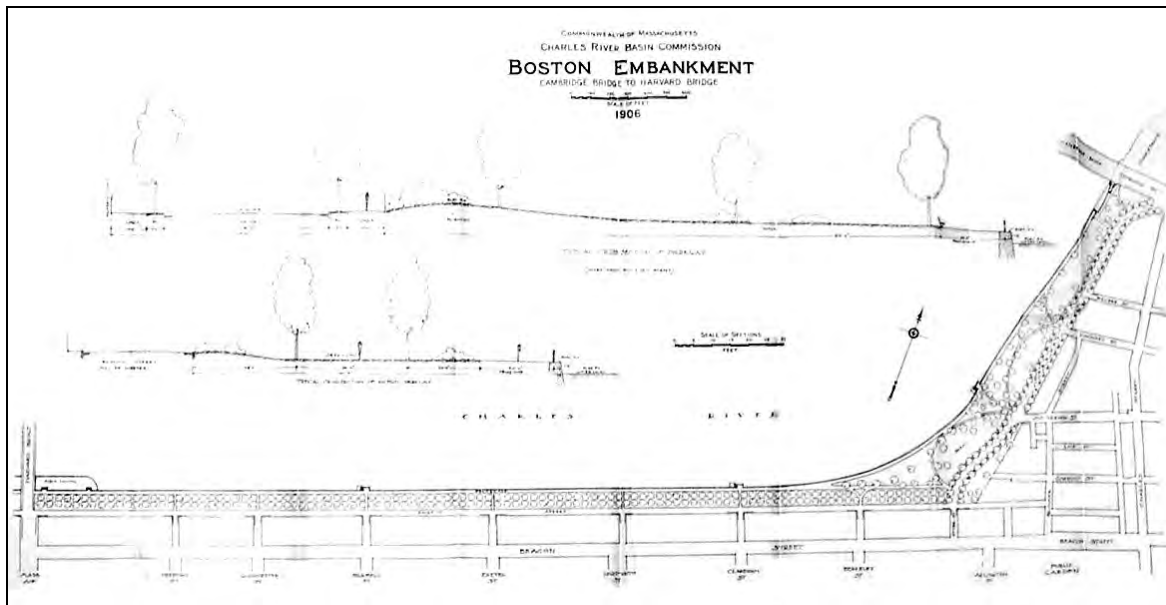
Schematic 1906 plan of Back Bay section of the Esplanade. (DCR archives)
